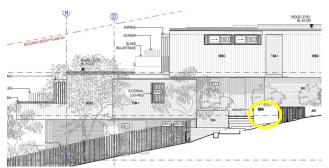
Extract of West / Street Elevation with non-compliant retaining wall circled in yellow.
